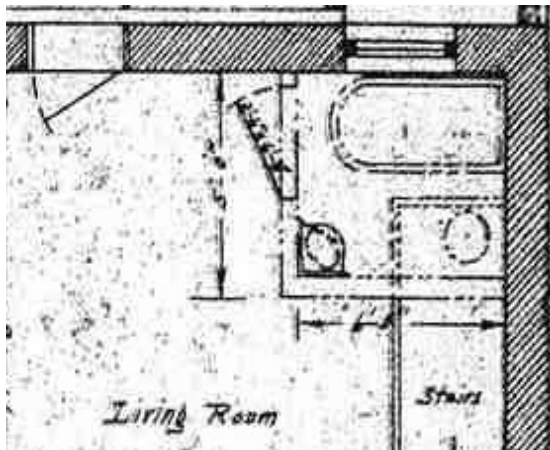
Close-up of bathroom on Kitchen floor plan from 1922 "Repairs & Improvements."
